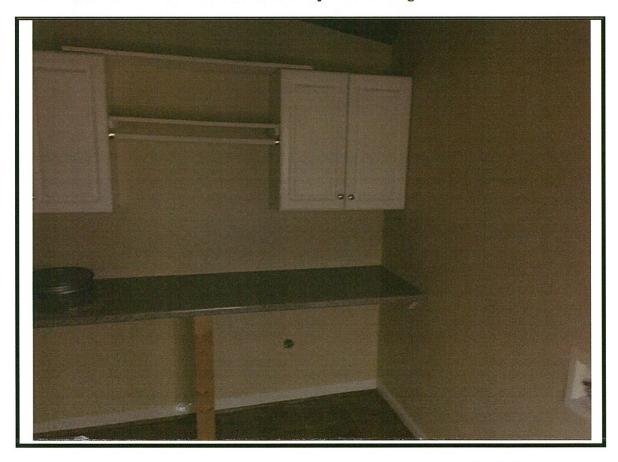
Drywall system components located within the laundry room on the Project Site.
